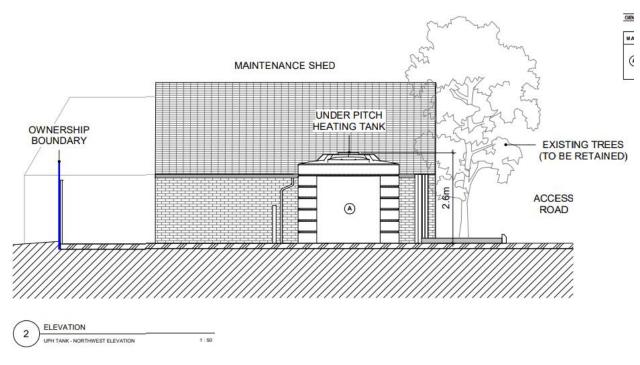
North-west elevation showing fuel tank and existing maintenance shed
